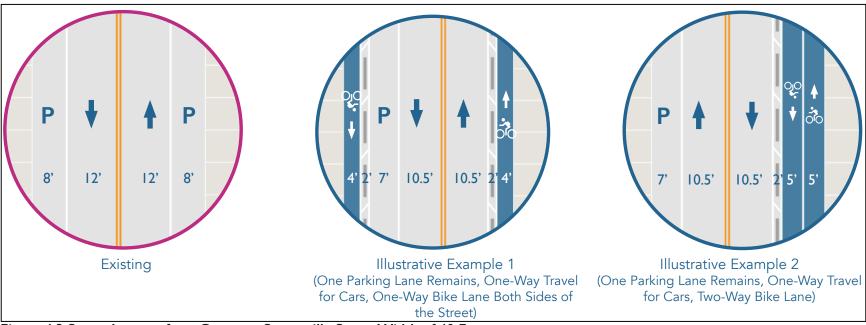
Street Layouts for a Common Somerville Street Width of 40 Feet
